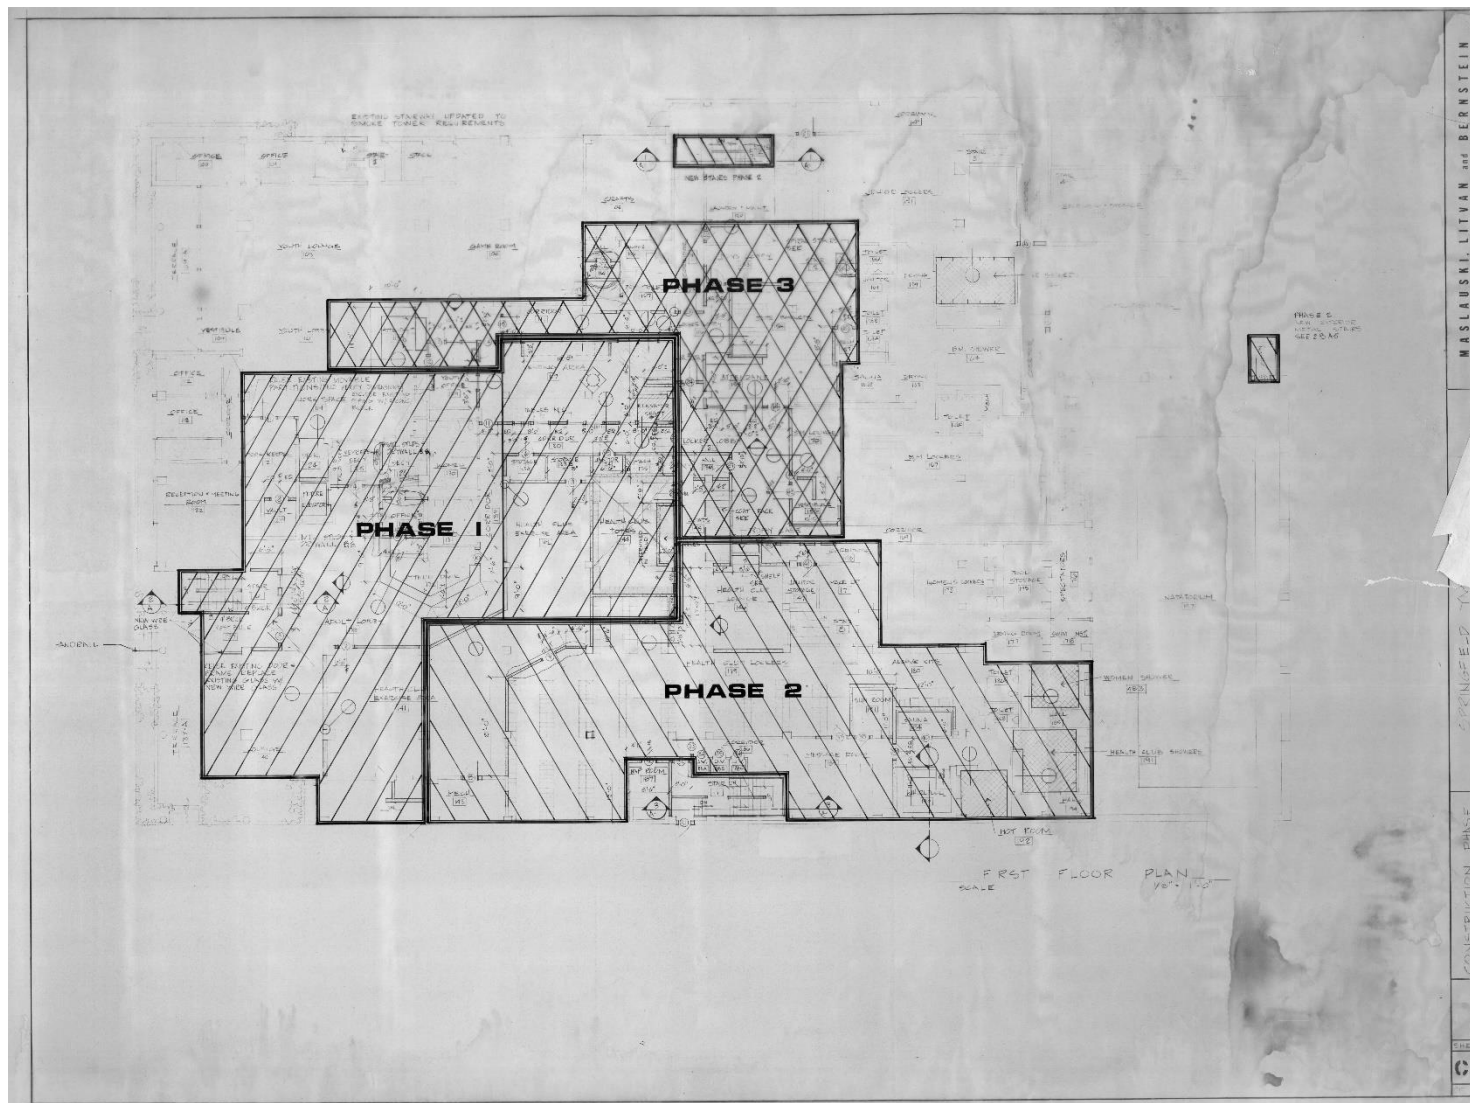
Construction Phase First Floor Plan, Springfield YMCA Renovation (Maslauski, Litvan and Bernstein 1975; Sheet No. CPA 1).
